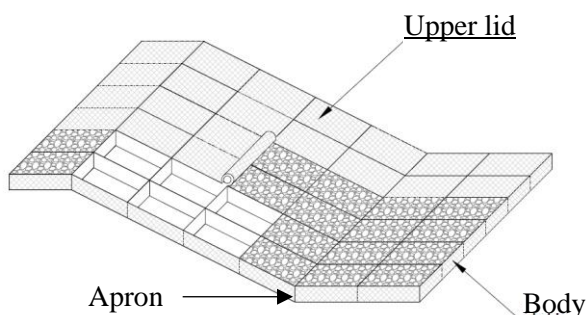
Sample Installation of Gabion Mattress on Slope
